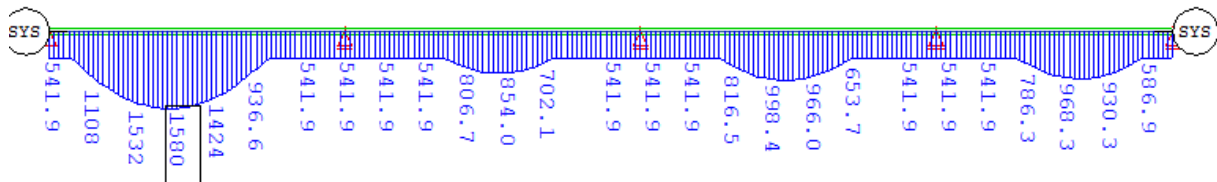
Longitudinal reinforcement for segment phase, concrete variant
